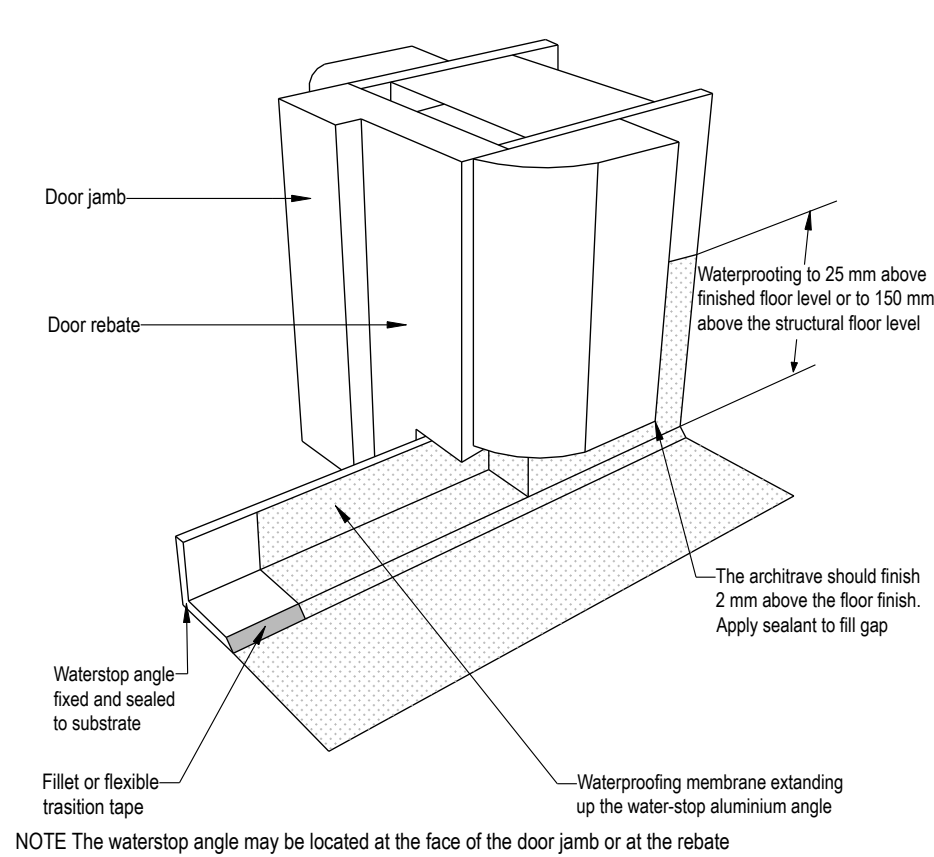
(A)- Example of liquid waterproofing at door opening framework
